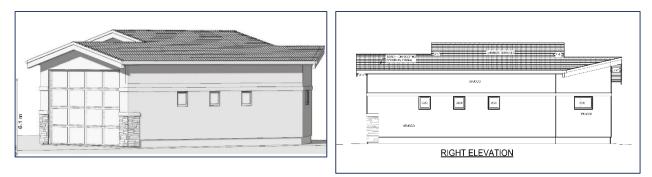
Proposed Building Perspective and Elevation Facing Bowes Rd
